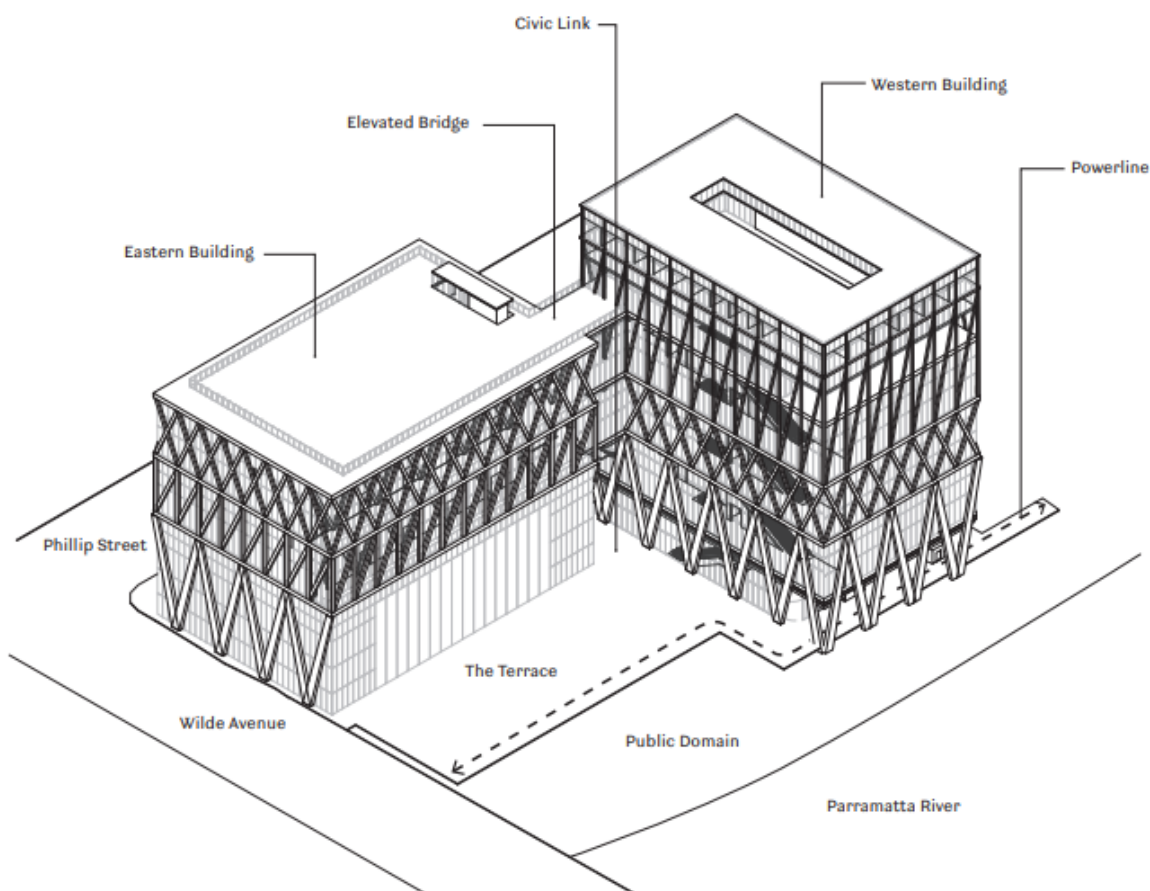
Proposed buildings that comprise Powerhouse Parramatta
